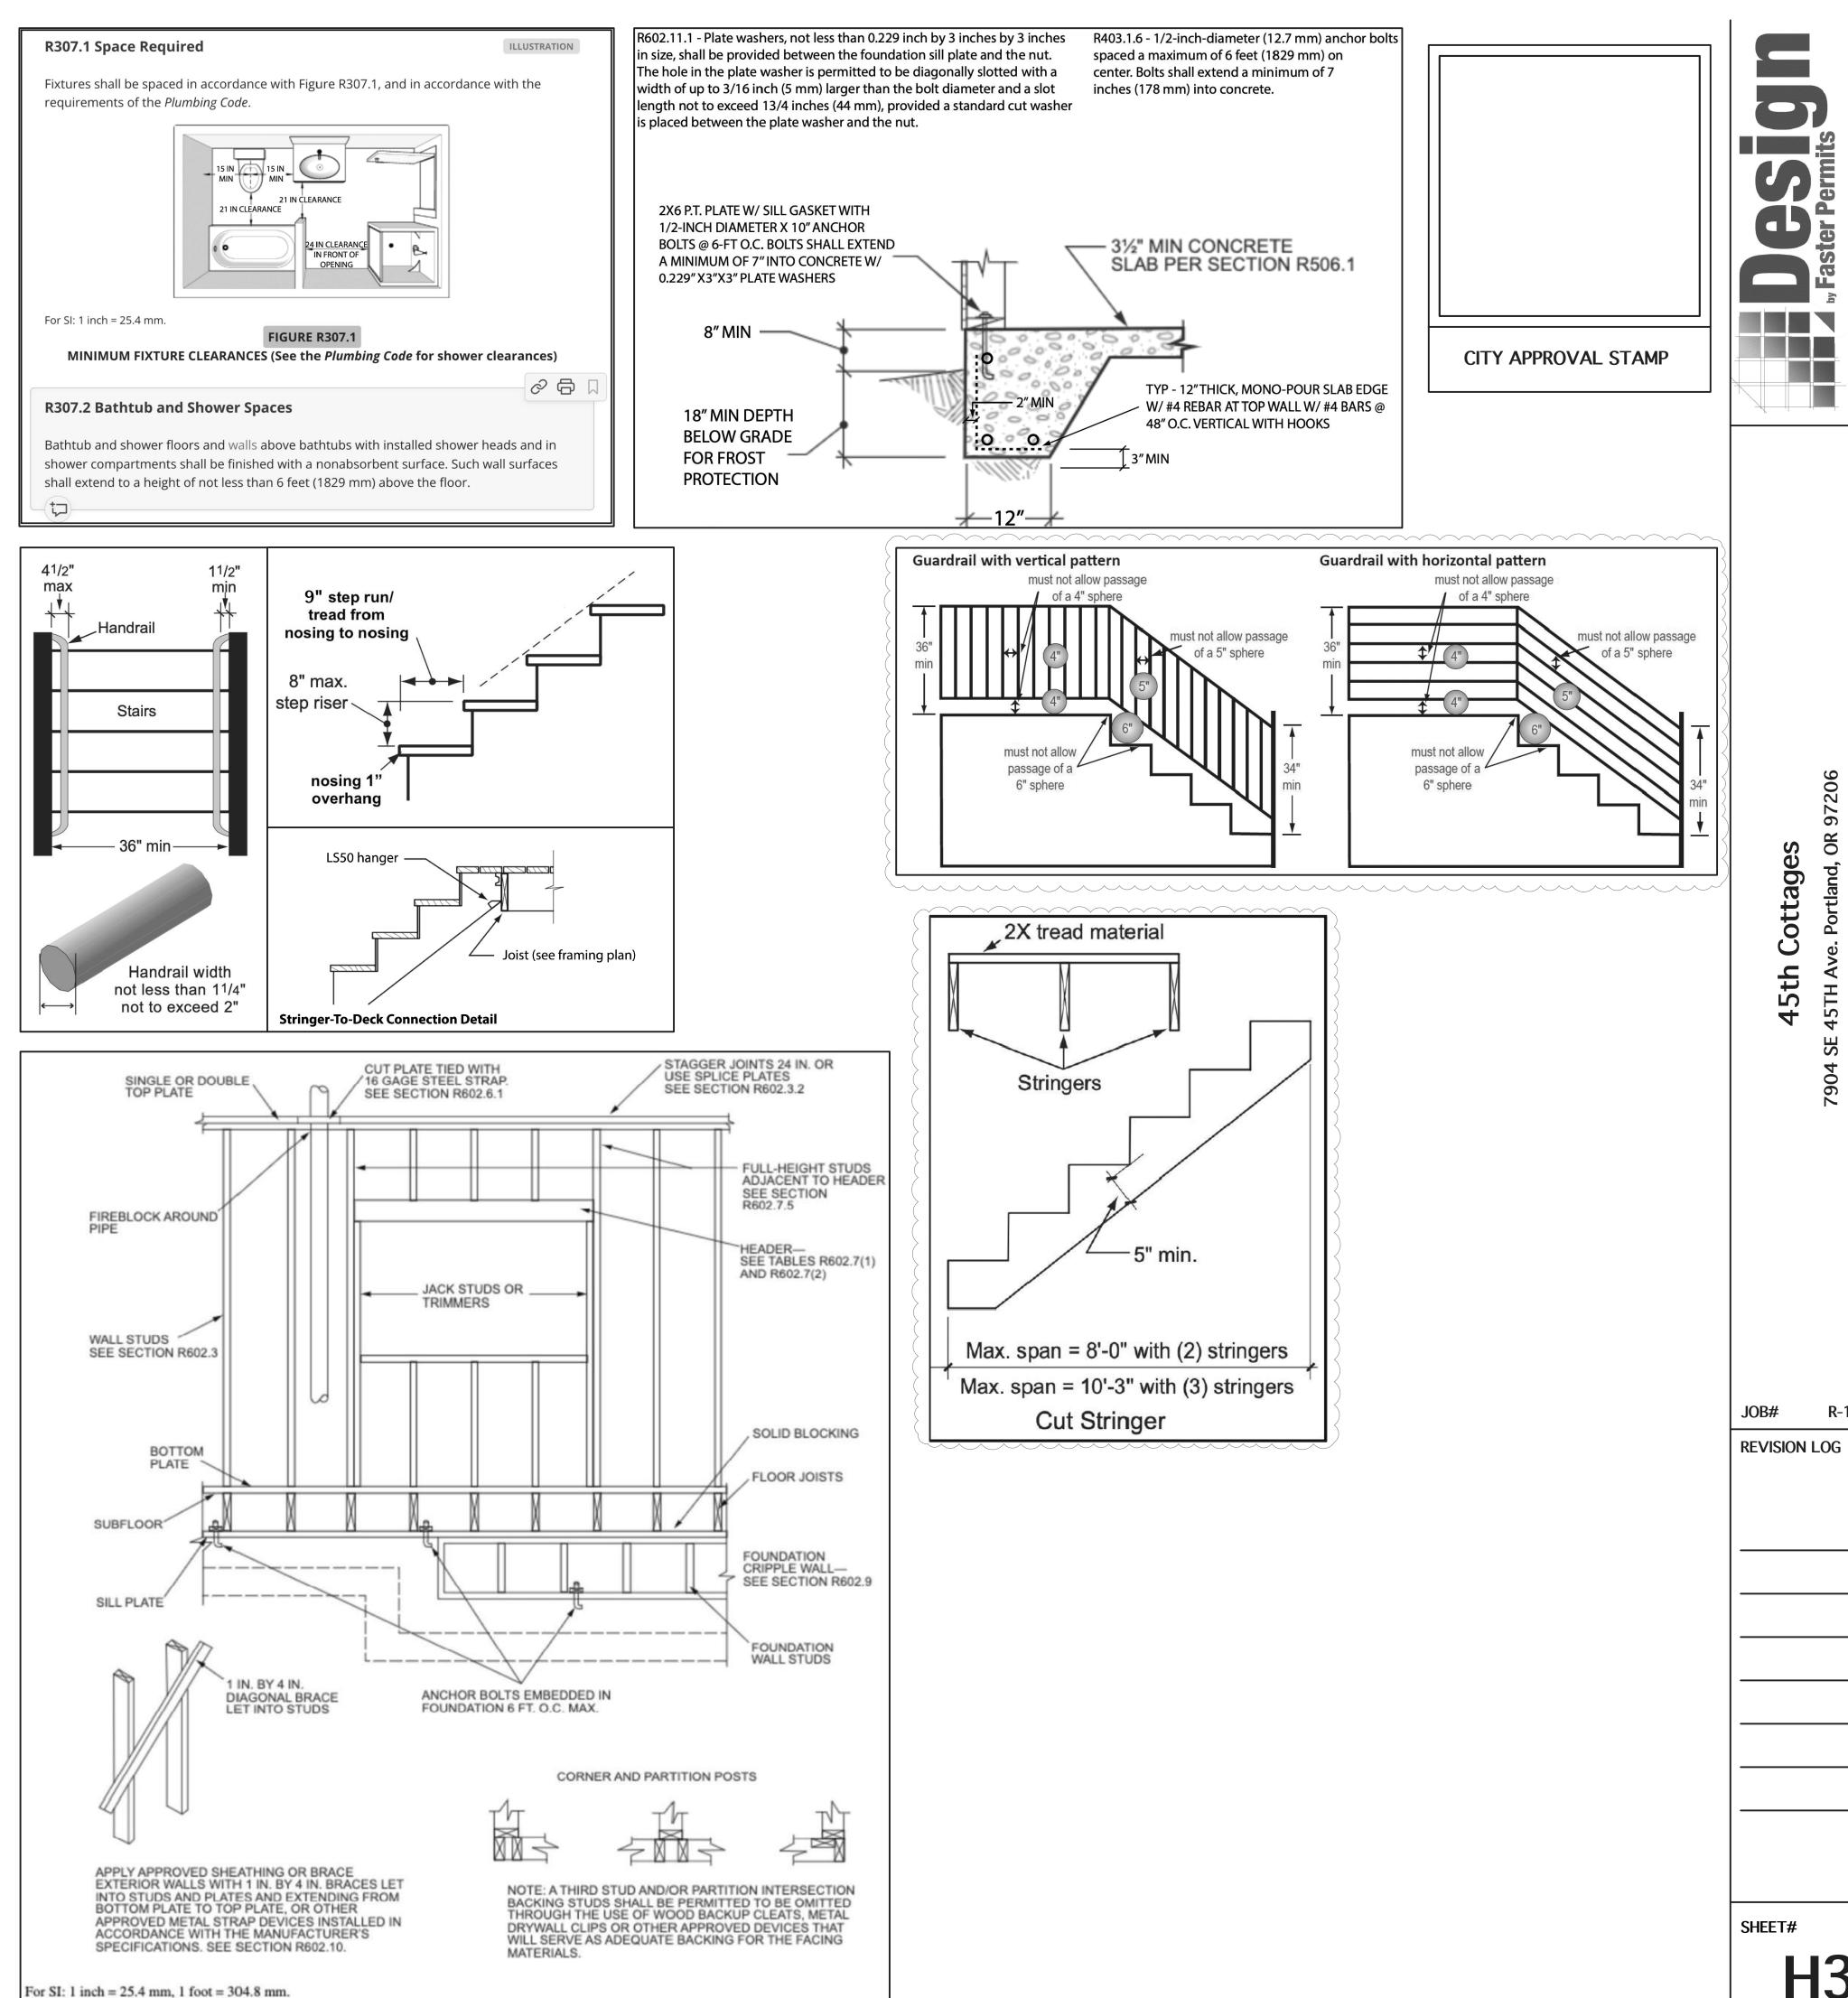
(2) FRAMING DETAILS SUBMITTED 08/29/2023
